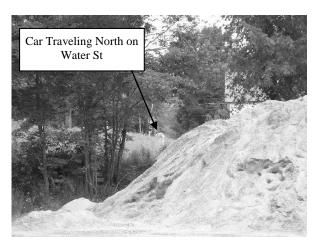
DPW Property Looking Northeast at Sand Storage Area
